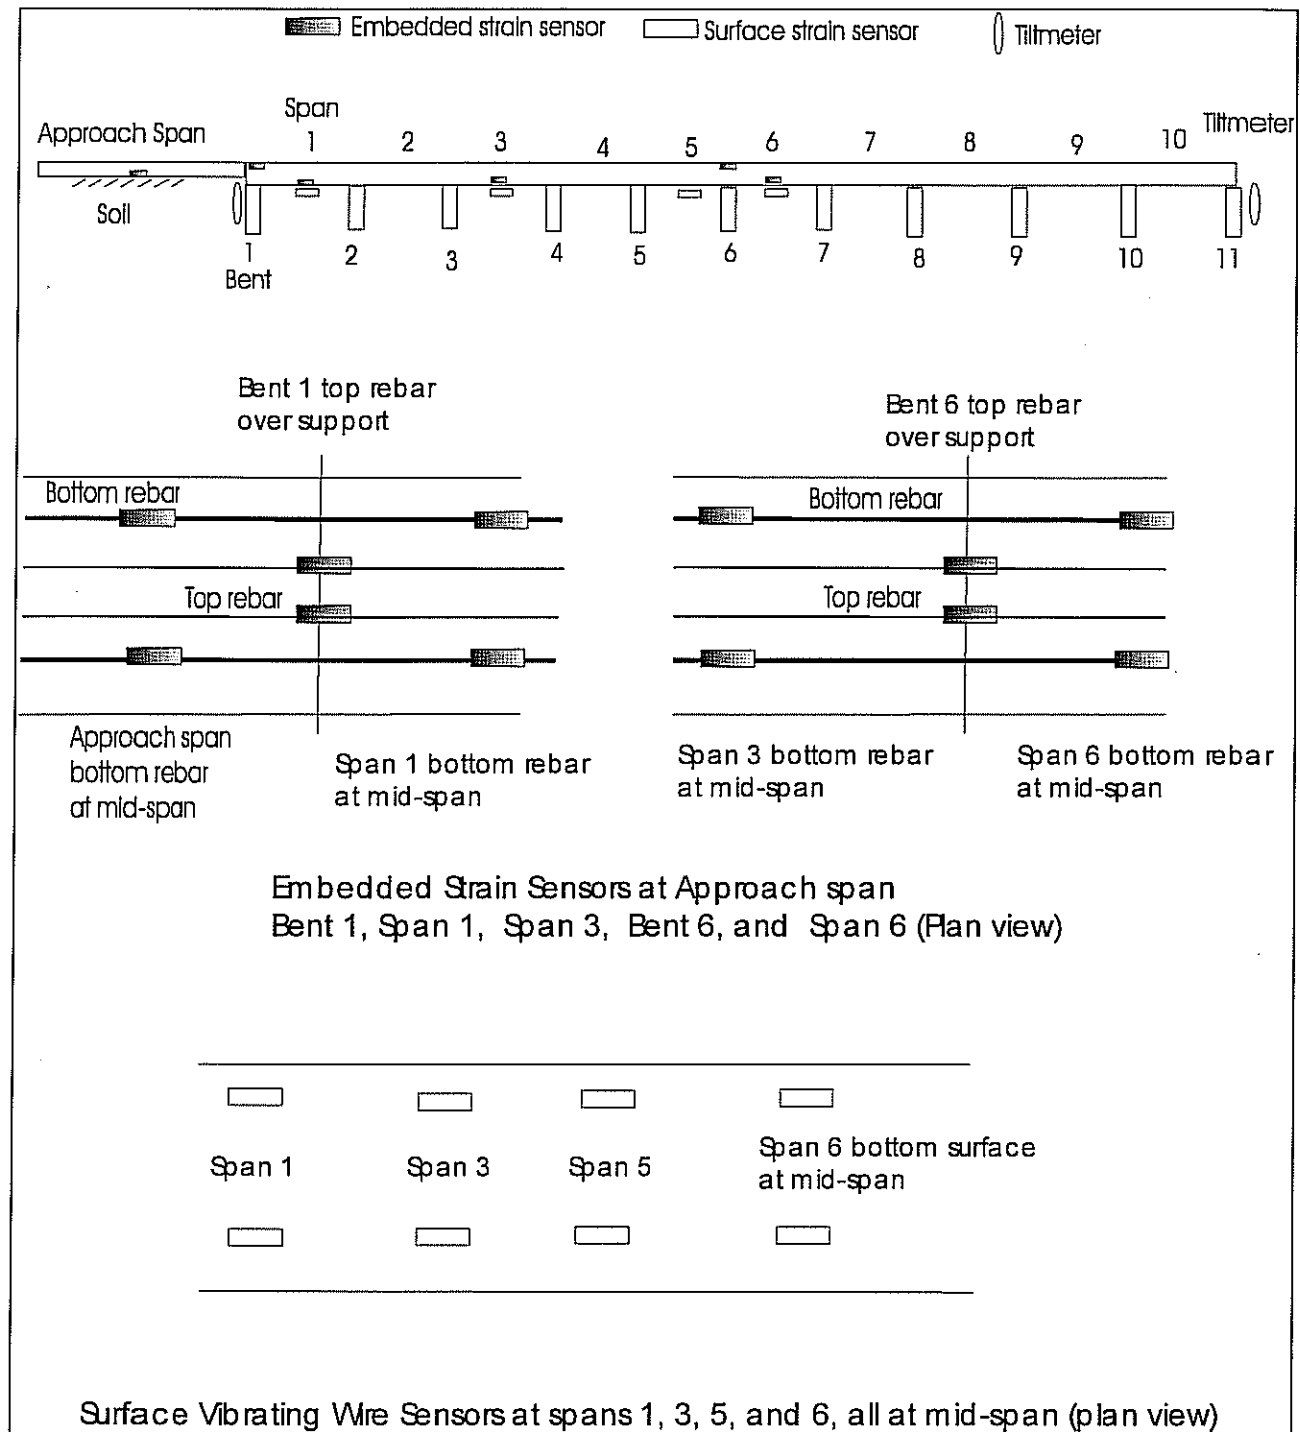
Instrumentation plan for the superstructure at Caminada Bay Bridge
